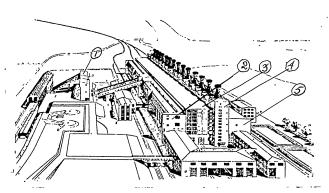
STALINGORSK PULVERIZED-GOAL GRES General layout of the power plant building on the bunker side and coal conveying and crushing installations.
